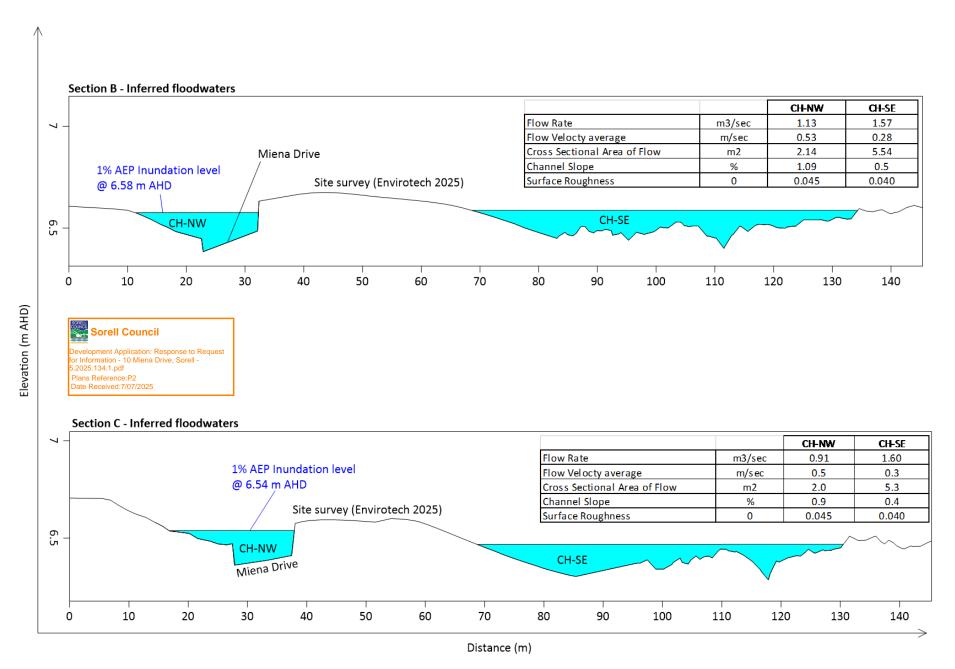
AEP Site Stormwater Flow Analysis – Cross Section B and C Within Miena Drive - Drawings Are to Scale and For Conceptual Modelling Purposes Only
